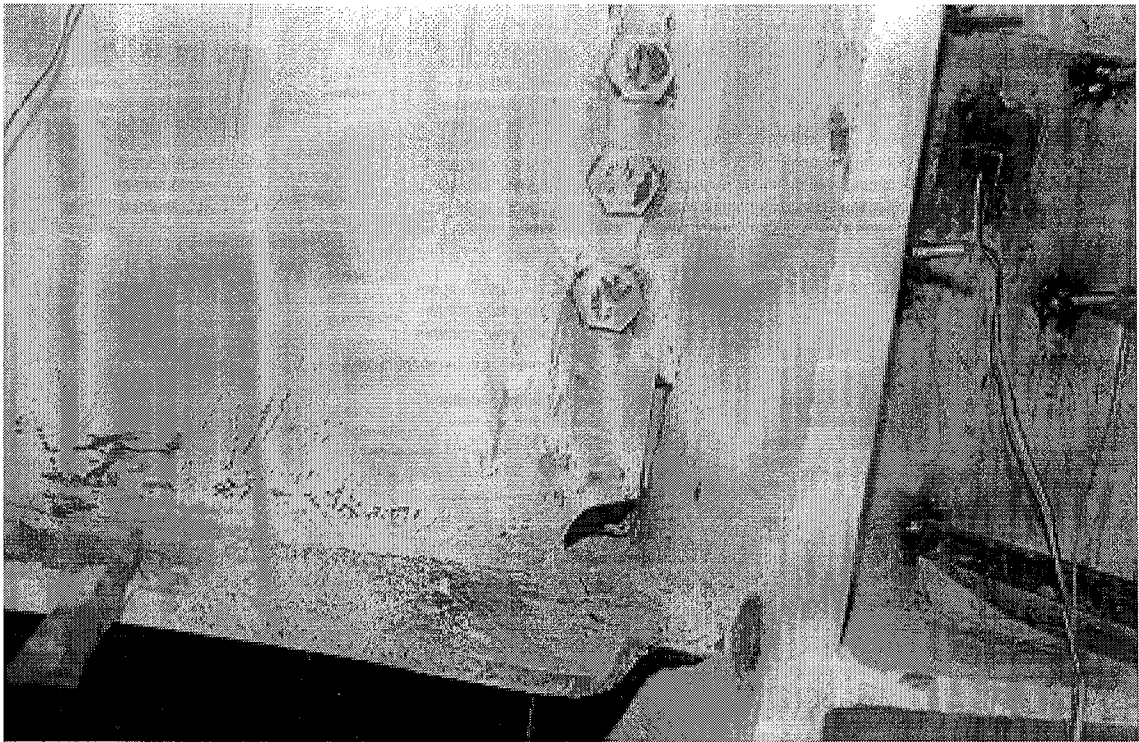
Rupture of Girder Bottom Flange (East Girder of Specimen 3)
